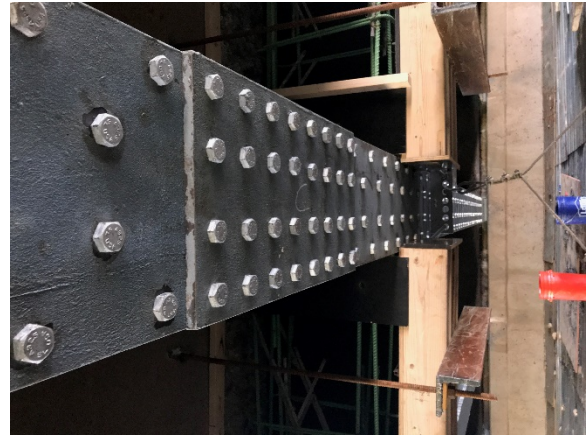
Cuthbert Blvd. Bridge – Structural Steel
